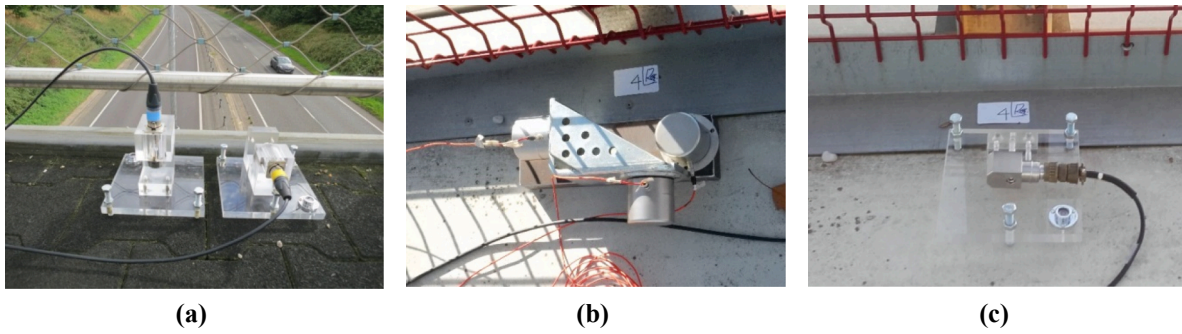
Accelerometers: (a) Honeywell QA750; (b) PCB 393C; (c) Dytran 3166B1.
